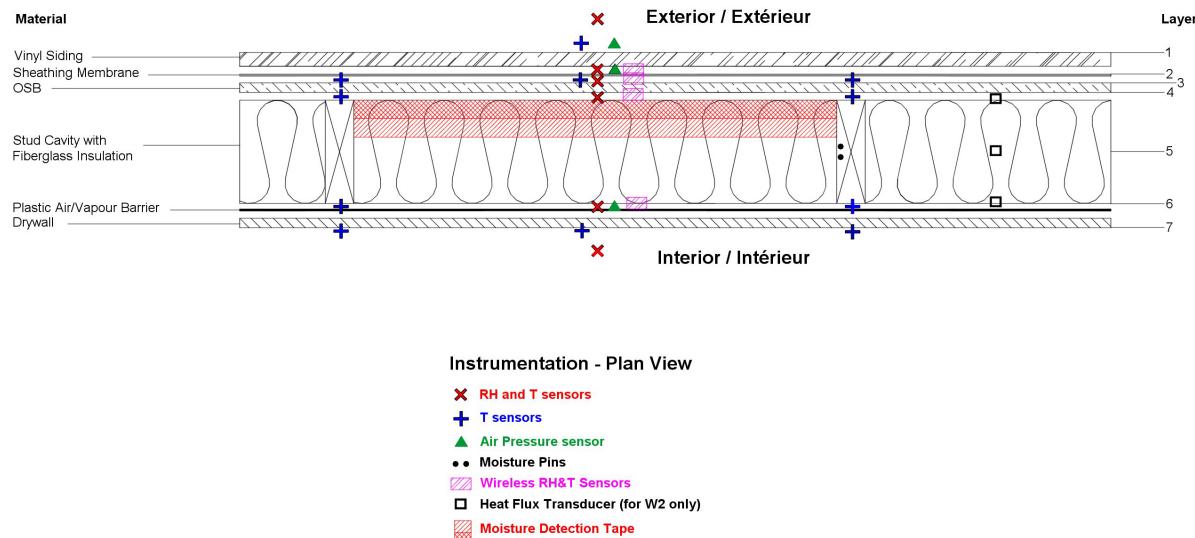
All 2006-07 test specimens' composition and layout of the instrumentation.
